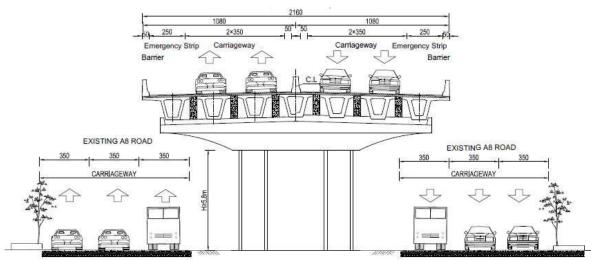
Typical Cross Section of Bridge of K15+564-End Point
